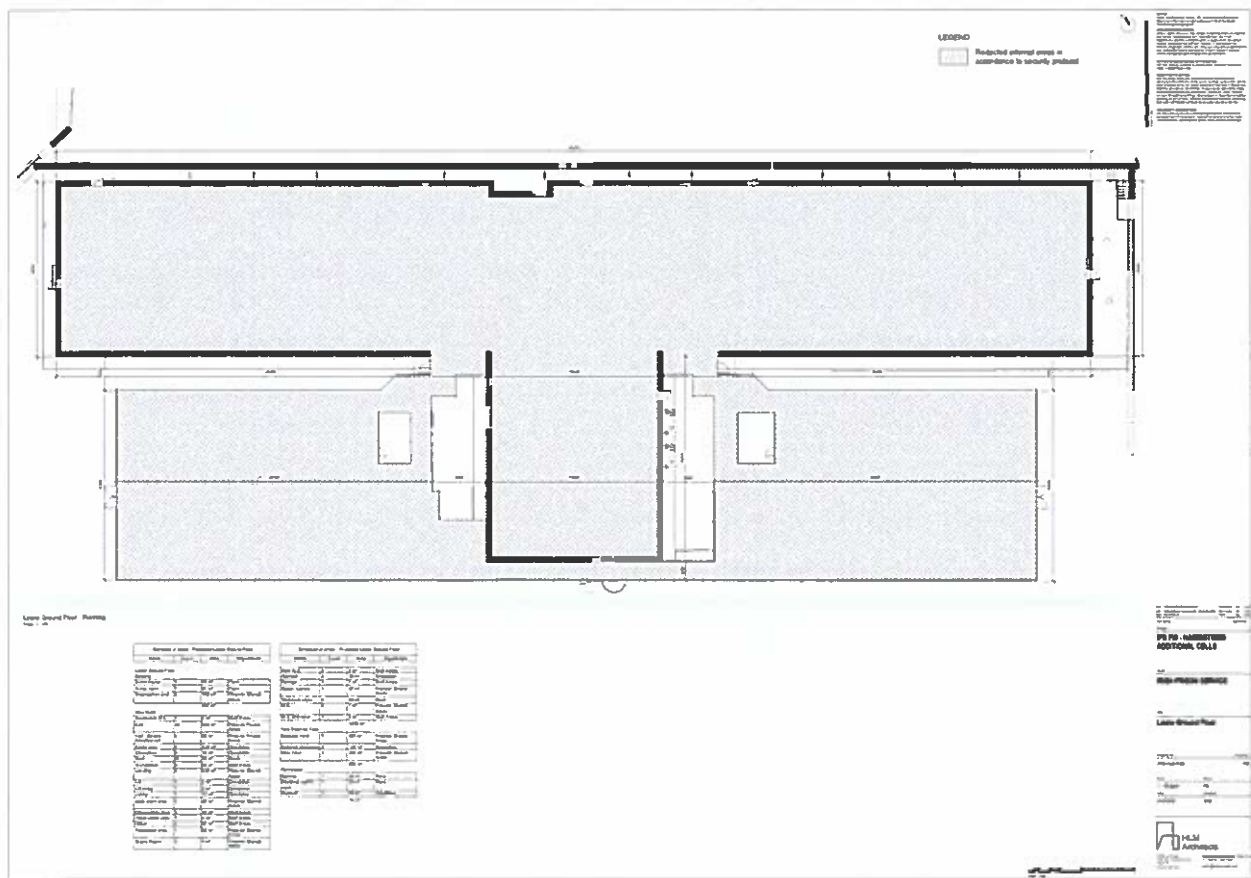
Proposed lower ground floor plan (Source: HLM Architects)
